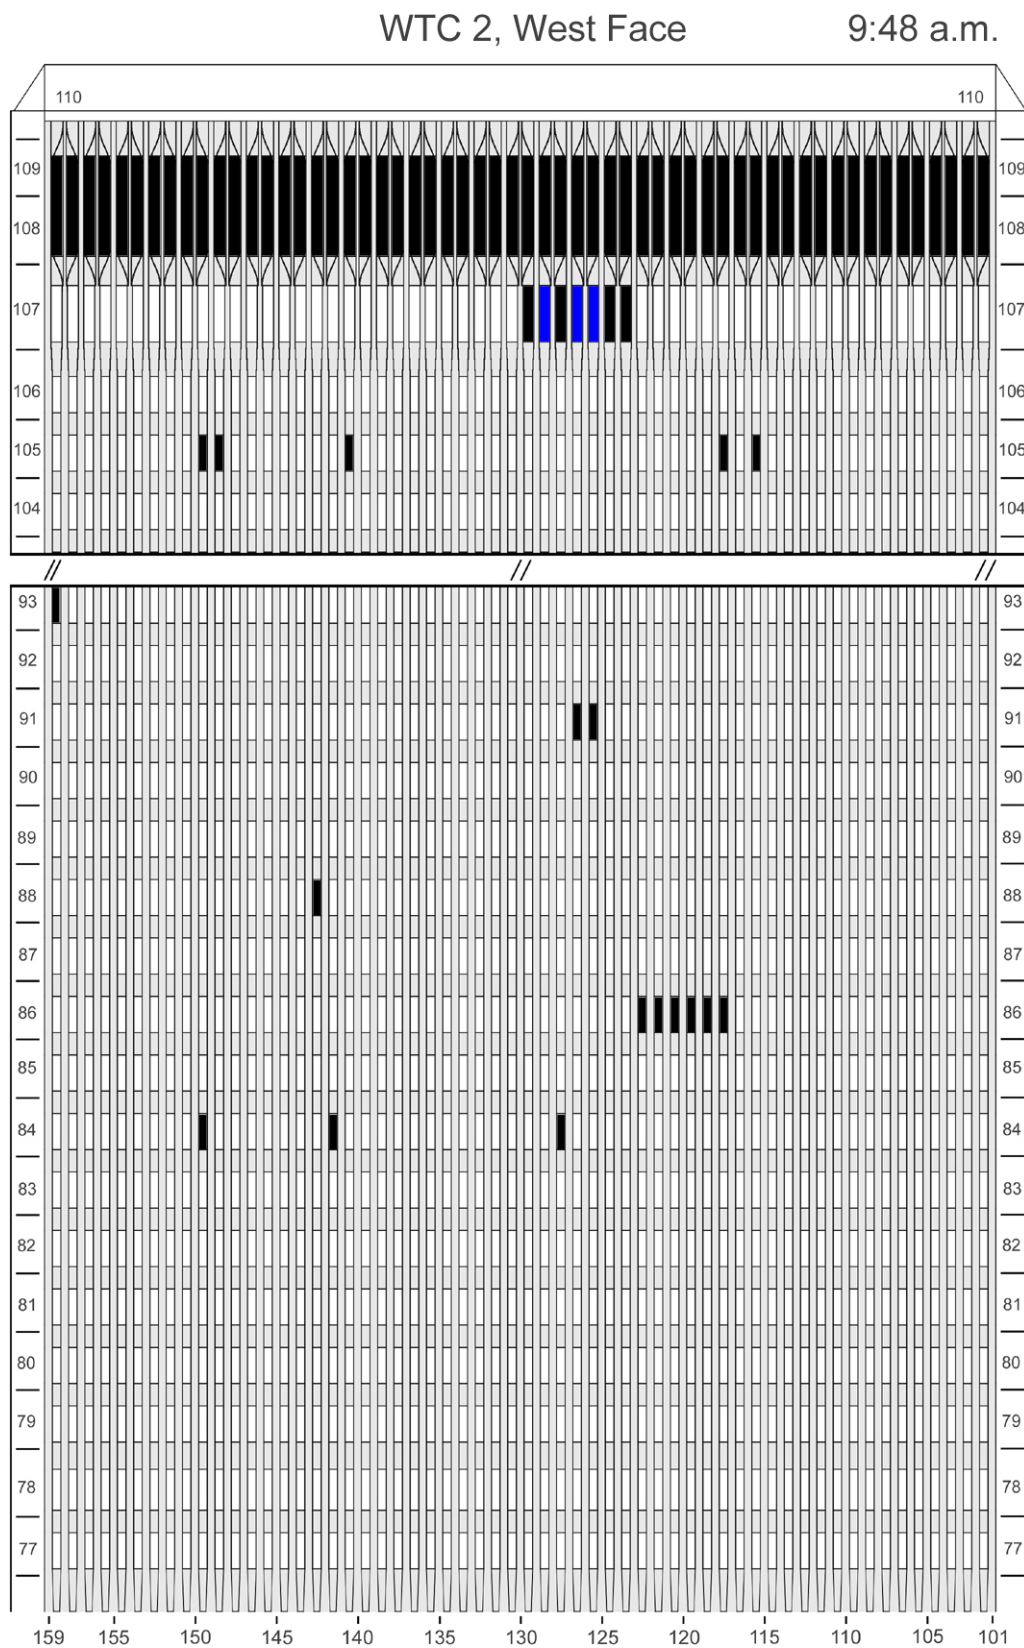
Diagram of the west face of WTC 2 for floors 77 to 93 and floors 104 to 110 at 9:48 a.m. showing the condition of windows and locations of fires.
